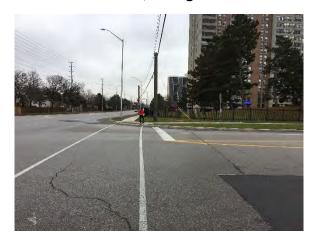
Entrance to Fallingdale Park Northeast of Bramalea Road, facing east
